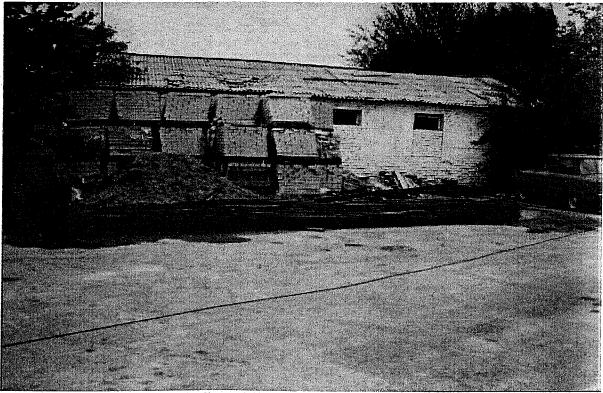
The centre plans to expand – new material for new houses is stored at the back of the building (Picture: TRAFFIC Europe/Andrei Zatoka)
